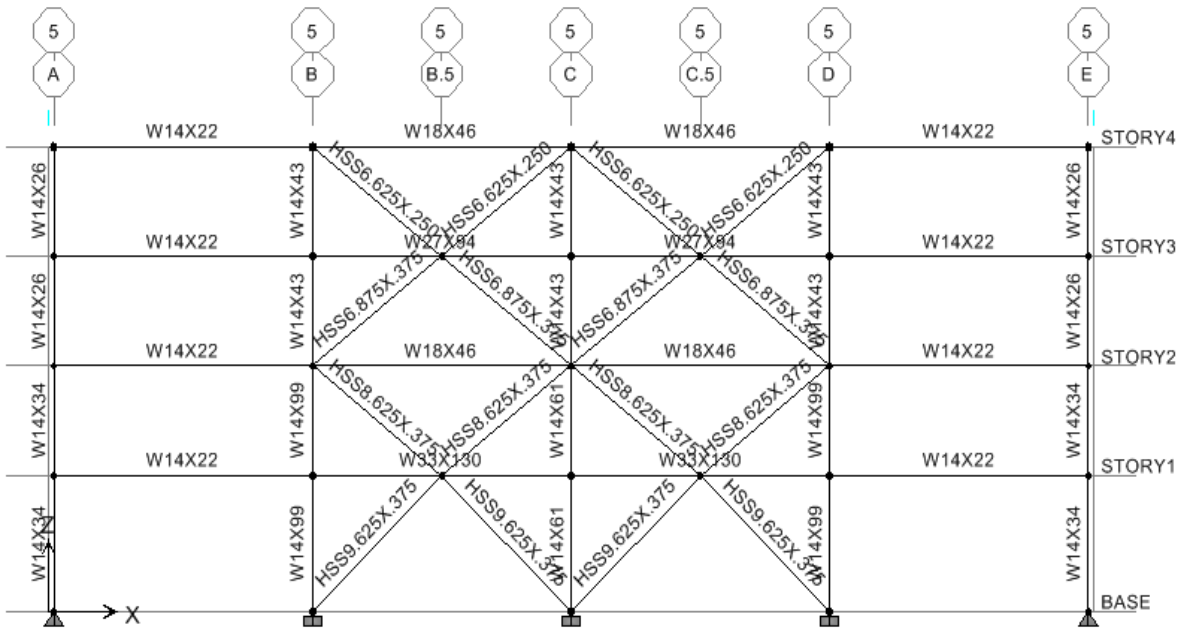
Elevation of Typical NBCC 2005 Braced Frame
